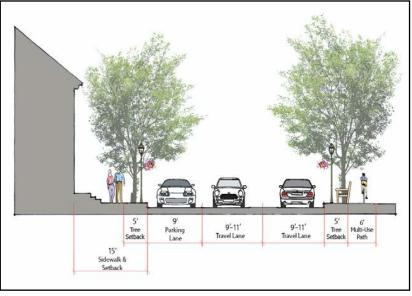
Example of a street with accommodations for walking, biking, seating, lighting motorists, and parking.
